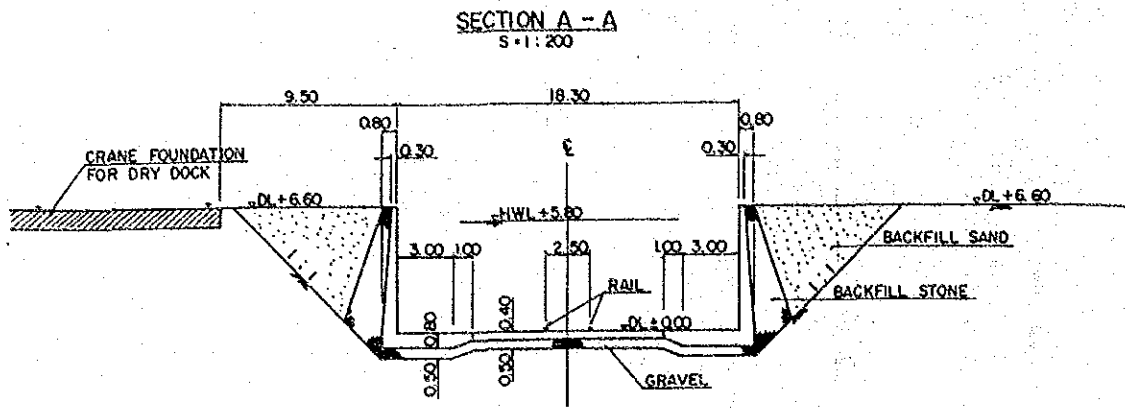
Typical Cross Section of Slipway (1/2)
